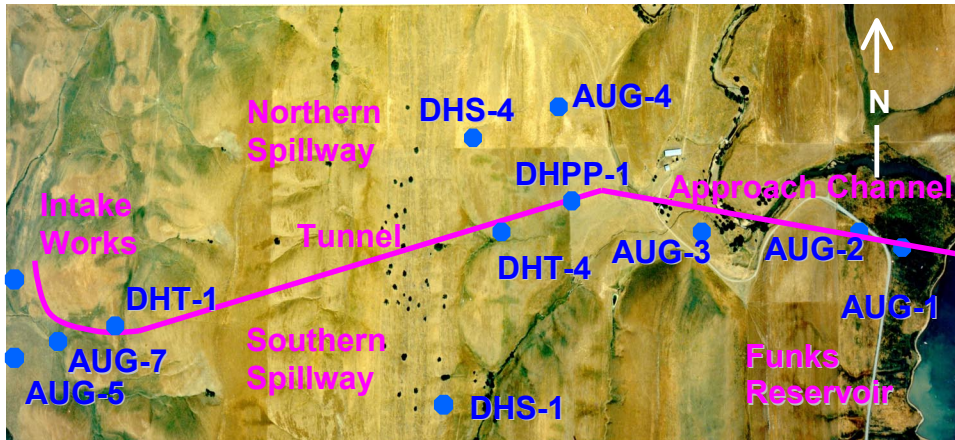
Aerial view of Golden Gate Inlet-Outlet Works and drill holes (see Plate 6)
